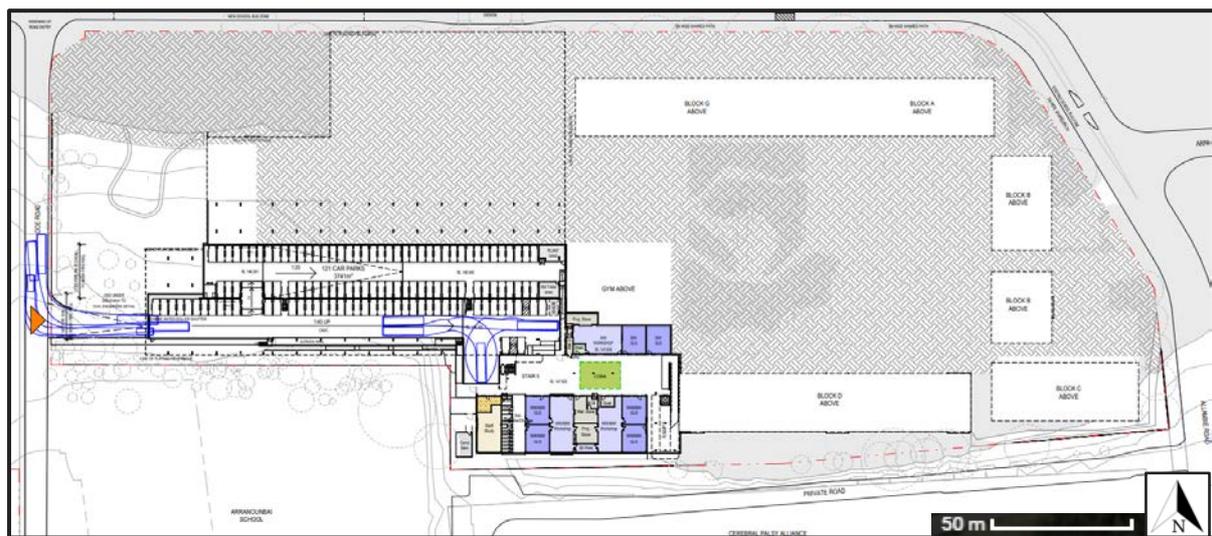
| Lower ground level plan – including underground parking and loading dock (Base source: Architectus, 2022)
